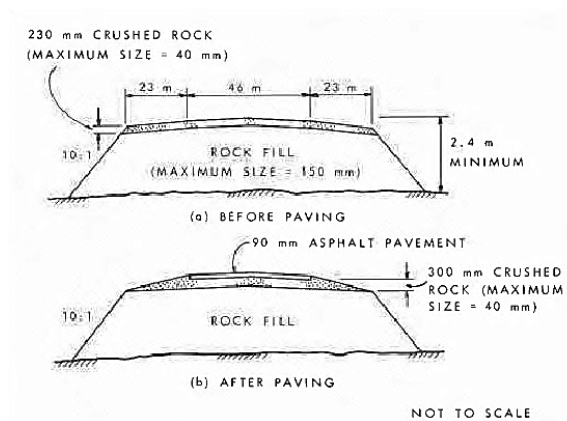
Typical cross sections, Inuvik Runway. From Johnston (1982).
